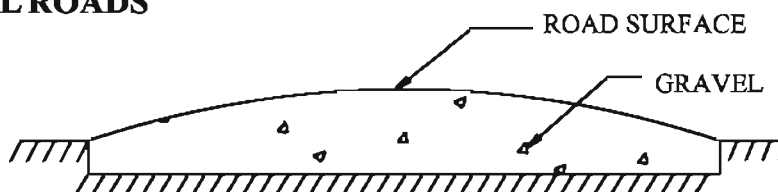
TRENCH TYPE CONSTRUCTION OF GRAVEL ROAD
